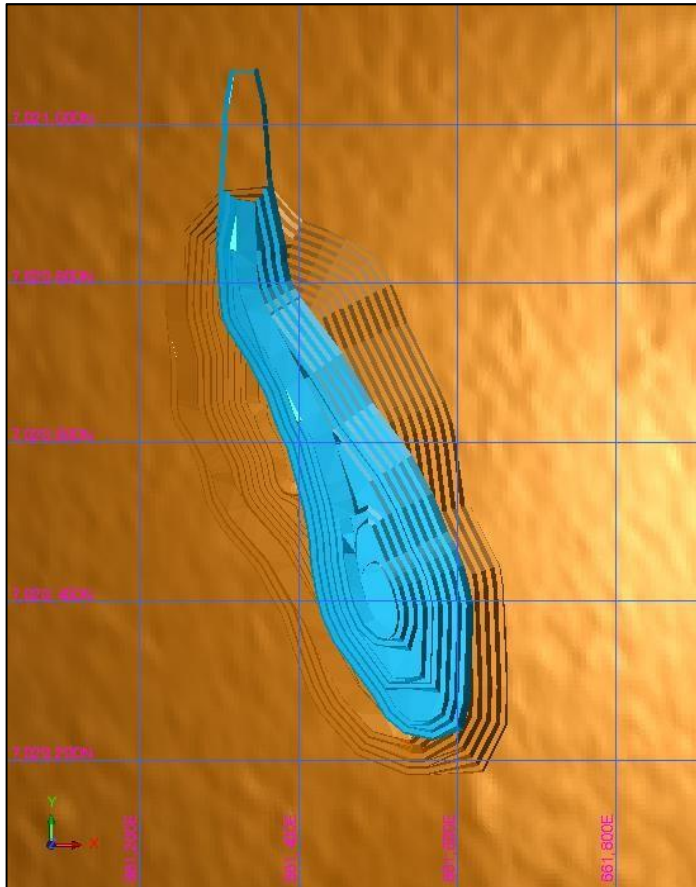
North Pit Stage 1 with Stage 1 topographic intercept to show ramp crest location
